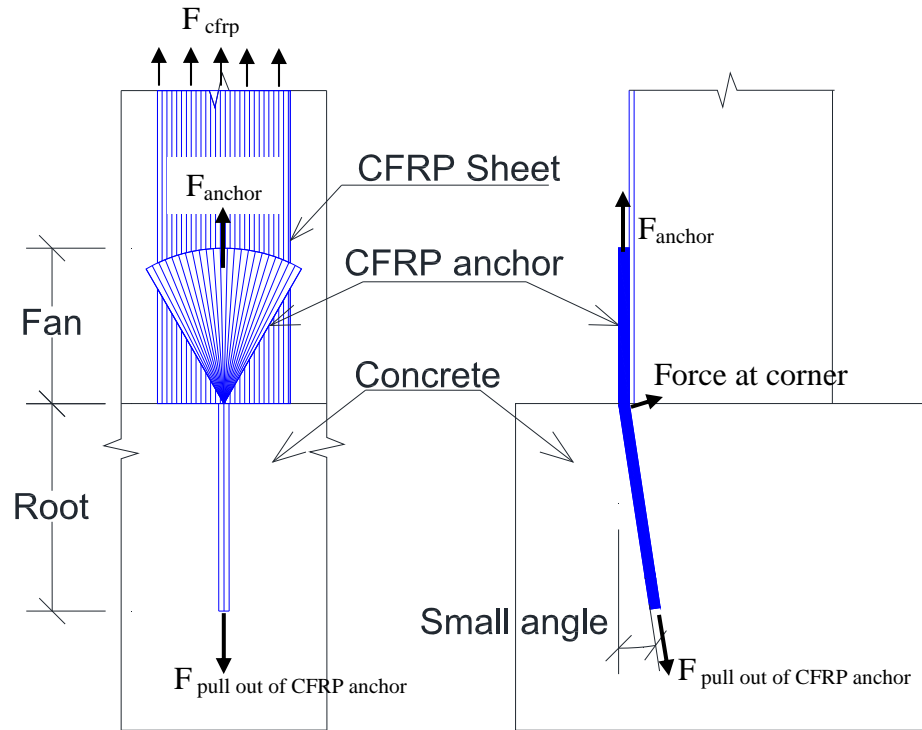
CFRP anchors applied to columns and wall for better attachment of the CFRP sheets
